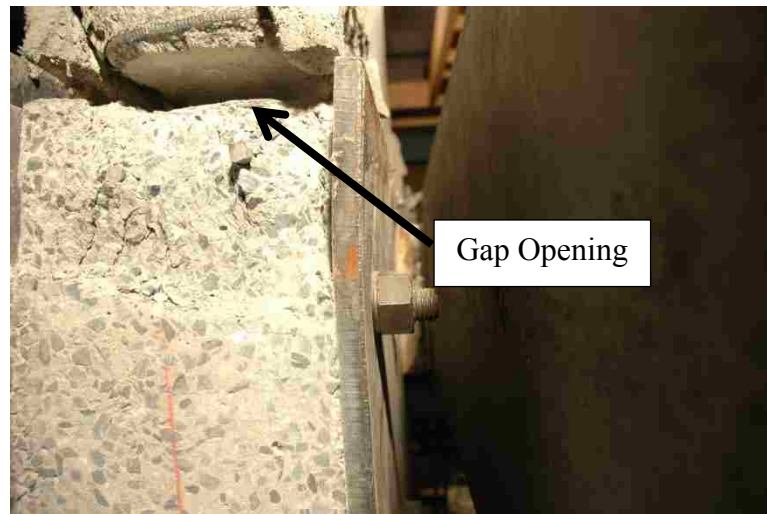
Gap Opening at Joint between First Story Plate-Confined Panel and Second Panel
